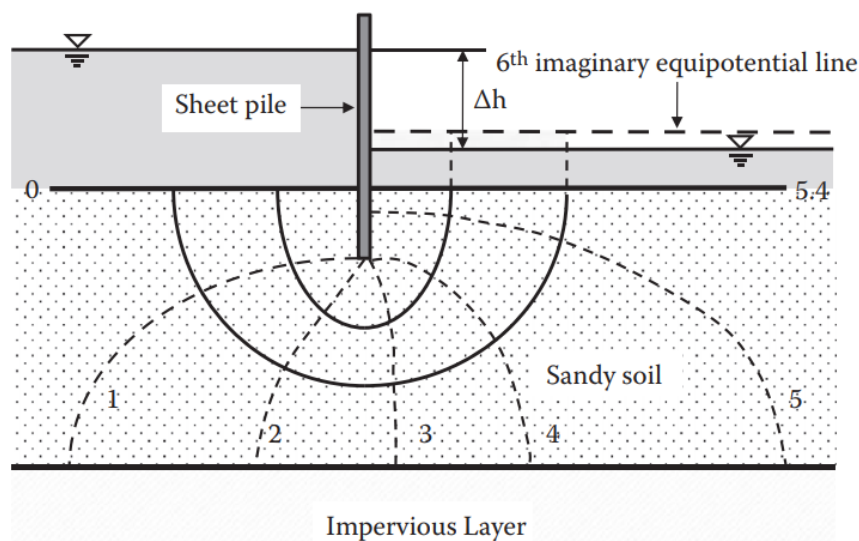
Two-dimensional flow net under a sheet pile wall
